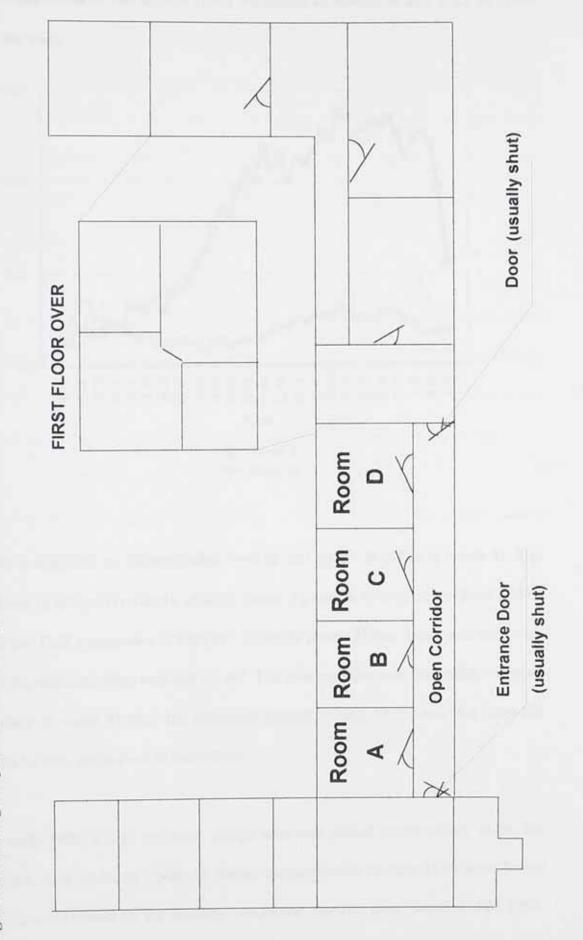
Kettering Hospital- Initial Building Plan Before Remediation
